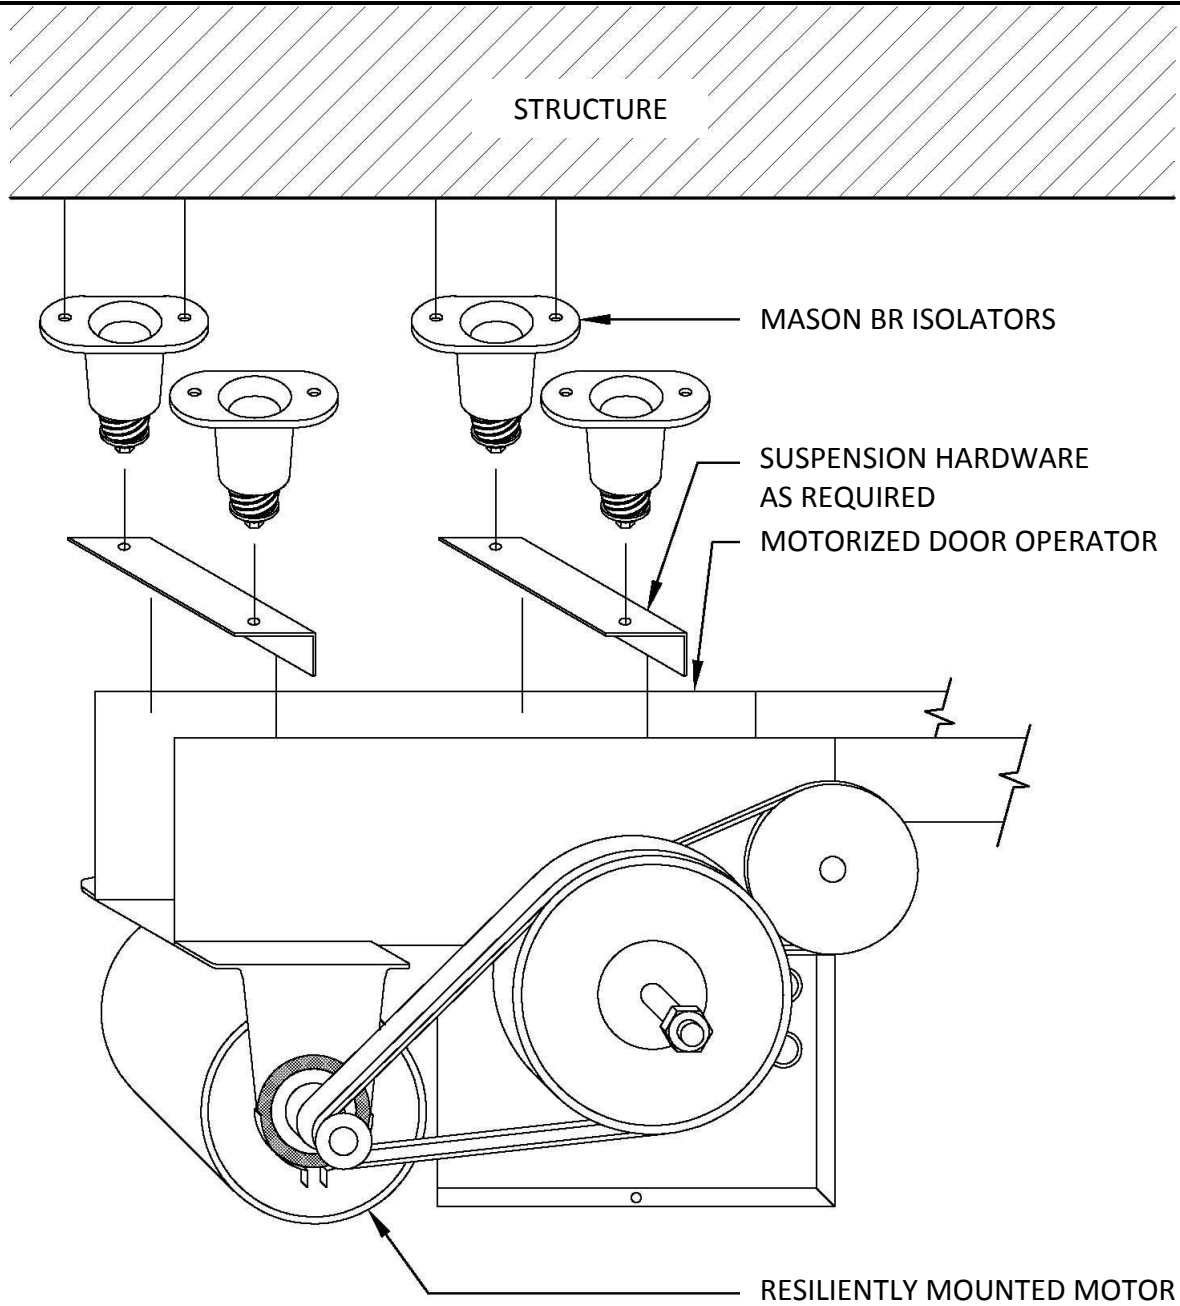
| GARAGE DOOR OPENER ISOLATION
